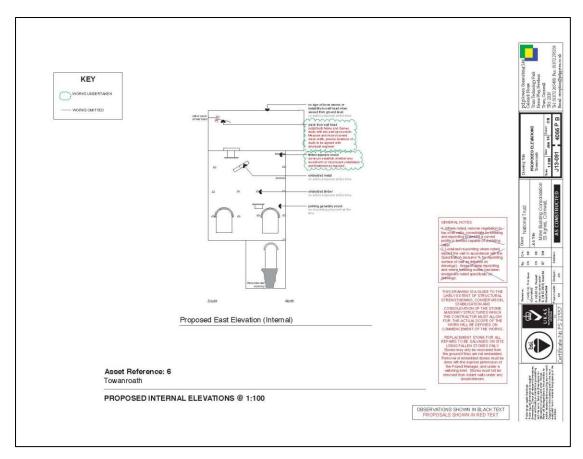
Eastern internal elevation of Towanroath pumping engine house.
